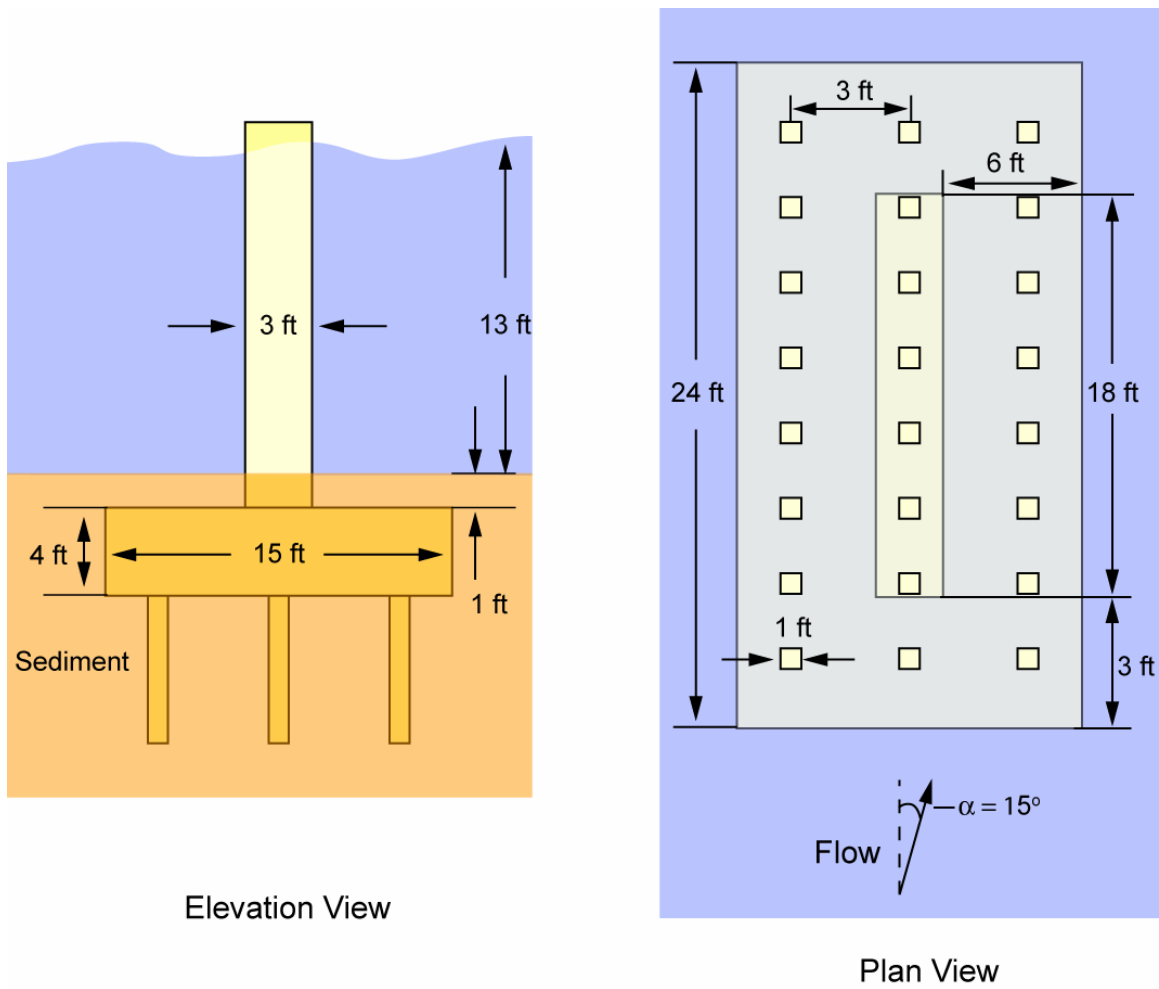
Elevation and plan view of the complex pier used in the Case 3 example scour calculation
